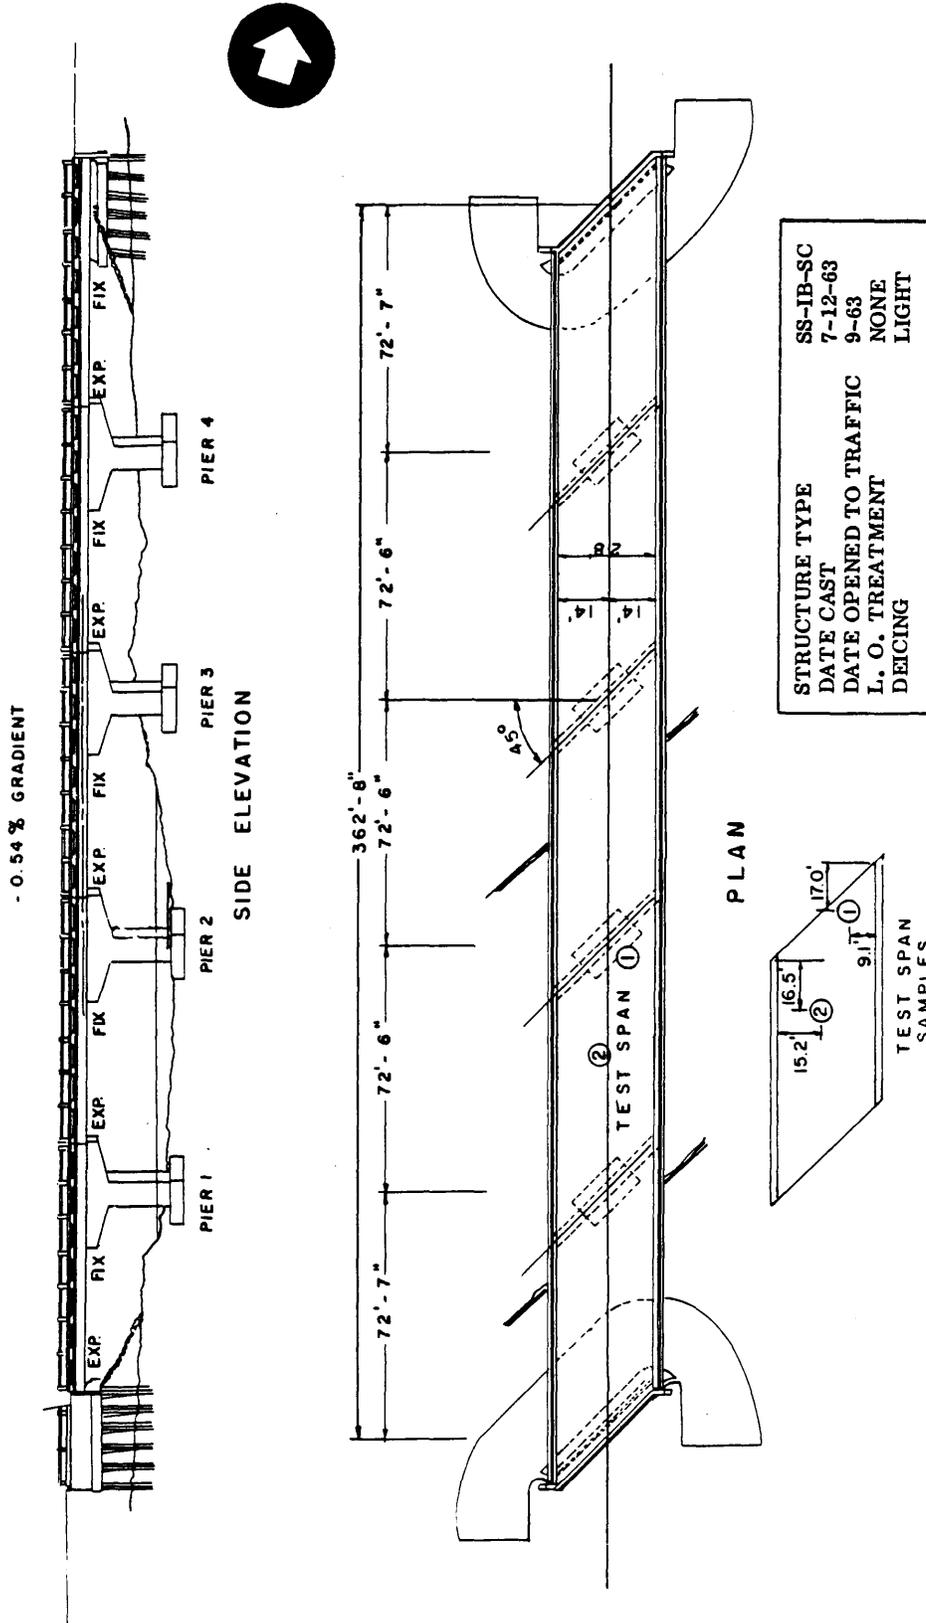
Plan for bridge #11; also shown are the locations of test samples.
